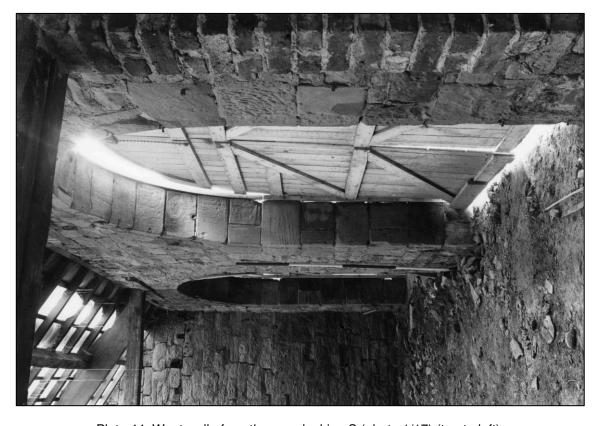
West wall of south room, looking S (photo 1/17) (top to left).
